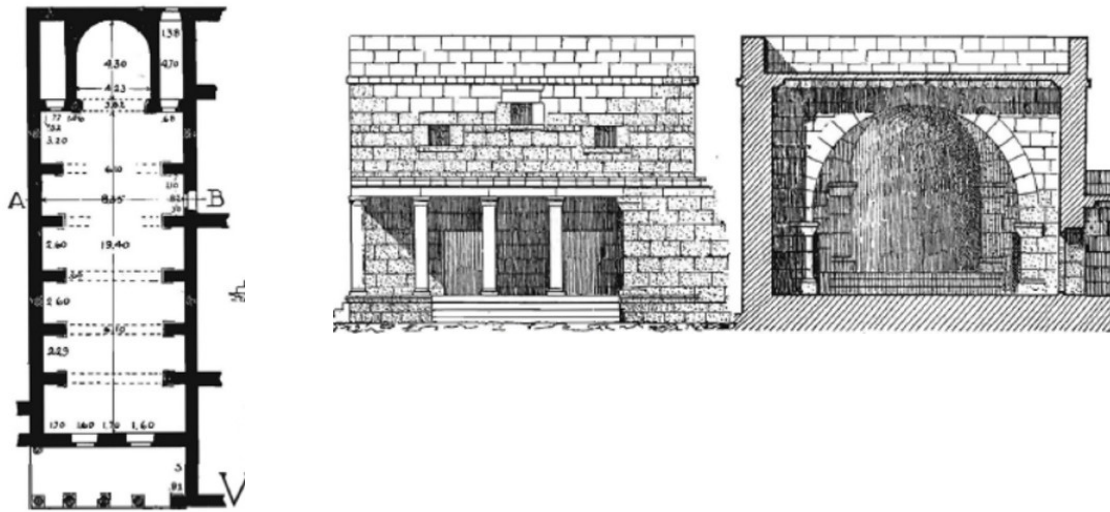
Masechos Church plan and main facade and section, Butler, 1913, p. 176
